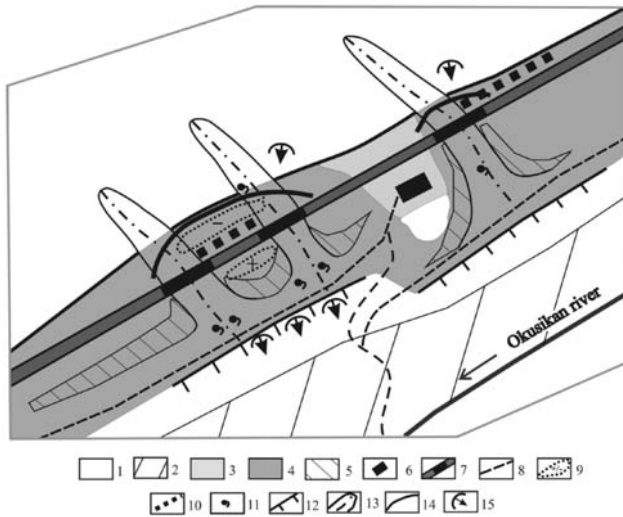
Diagrammatic plan of Kazankan site: 1 – natural slope; 2 – accumulative terrace of Okusikan river; 3 – outlier of moraine; 4 – zone of railroad construction; 5 – steep slopes; 6 – station; 7 – railroad bed with bridges; 8 – roads; 9 – zone with positive (negative) amplitudes of horizontal deformations; 10 – culvert; 11 – spring; 12 – steep benches; 13 – ravines with steep thalwegs; 14 – rotational slides; 15 – small landslide body.
